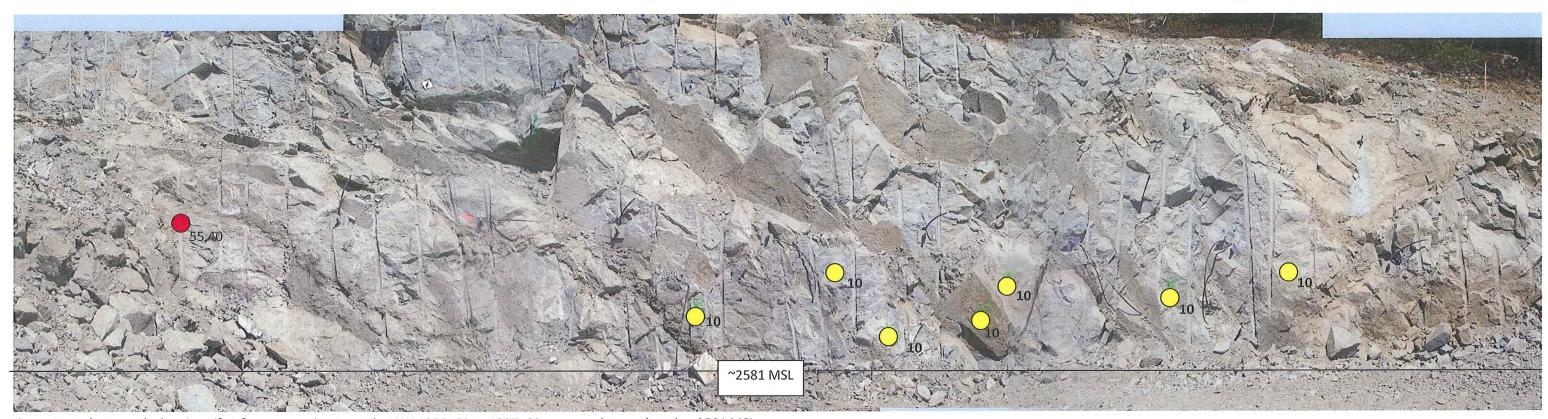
A photograph showing Lift 2 from approximate station LW 1336+60 to 1337+60 to approximate elevation 2581 MSL.
